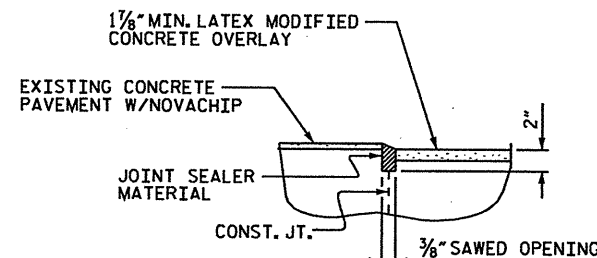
DETAIL FOR LATEX MODIFIED CONCRETE OVERLAY
